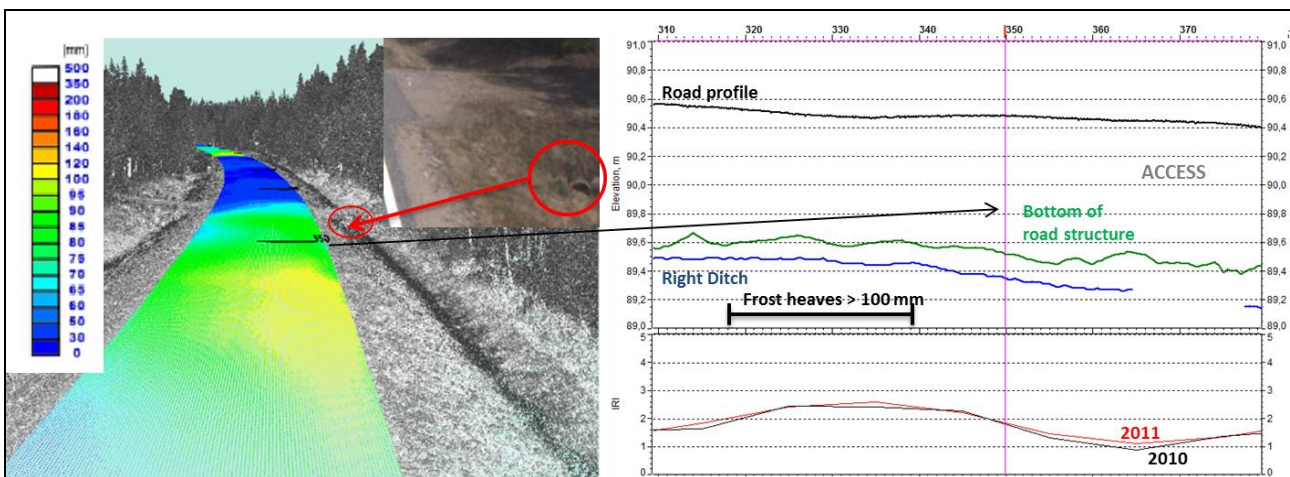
\_4. Example from road 934, section 4. The frost heaves above the private road access (chainage 370 m) can be related to the private road access. The inset photo shows, how the private road access culvert is clogged by vegetation and soil. The elevation data (upper right) shows the elevation of the road profile, elevation of the right ditch and the bottom of the road structure. The roughness values (second graph on the right) have risen higher than the average values. Frost heaves occur at the highest point, over 100 mm (yellow).
